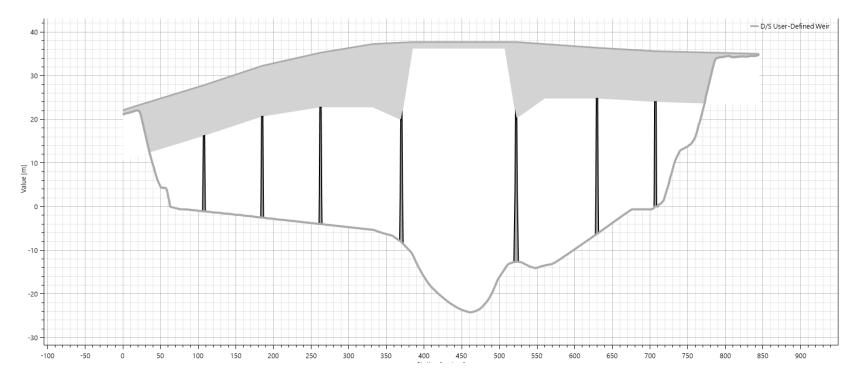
Existing Seal Island Bridge in hydraulic model (Options 1A, 1B, 1C)
